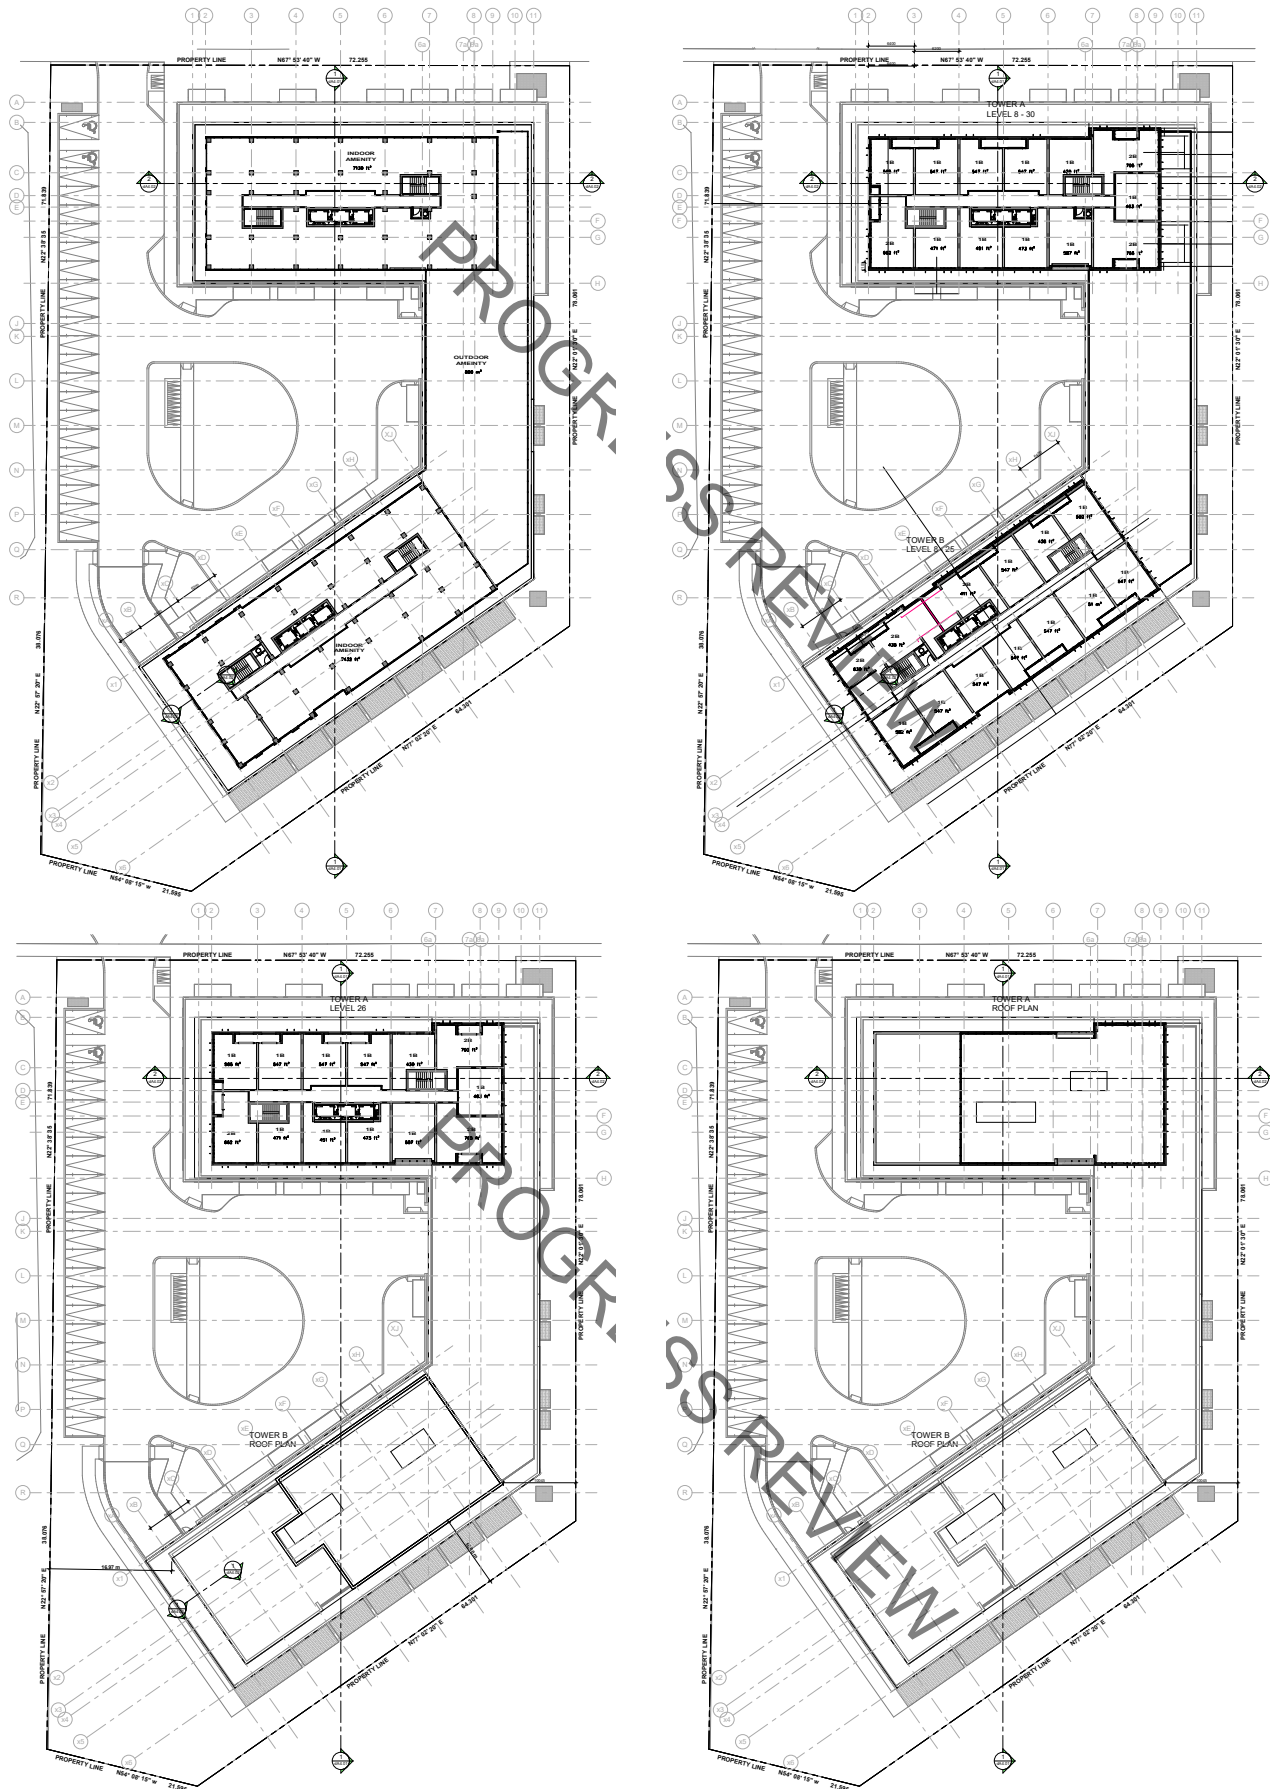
Floor Plans prepared by Kirkor Architects and Planners
